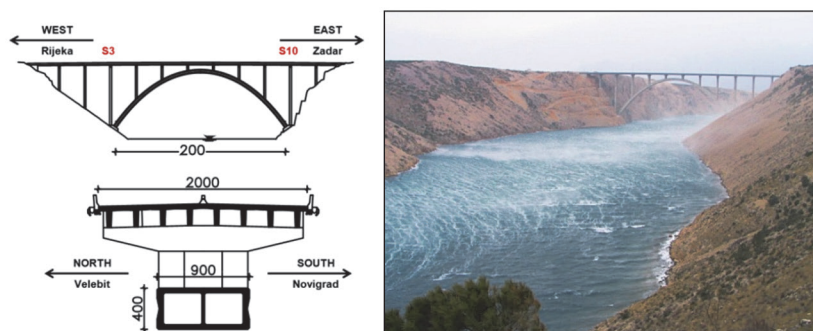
Maslenica Motorway Bridge: bridge layout (left) and Bora wind at the bridge location (right)
